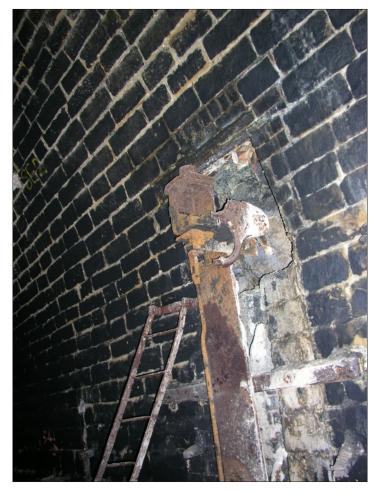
Woodhead Tunnel: Detail of signal lamp showing similar infilled cavity behind suggesting that apparatus was also secondary in this position
